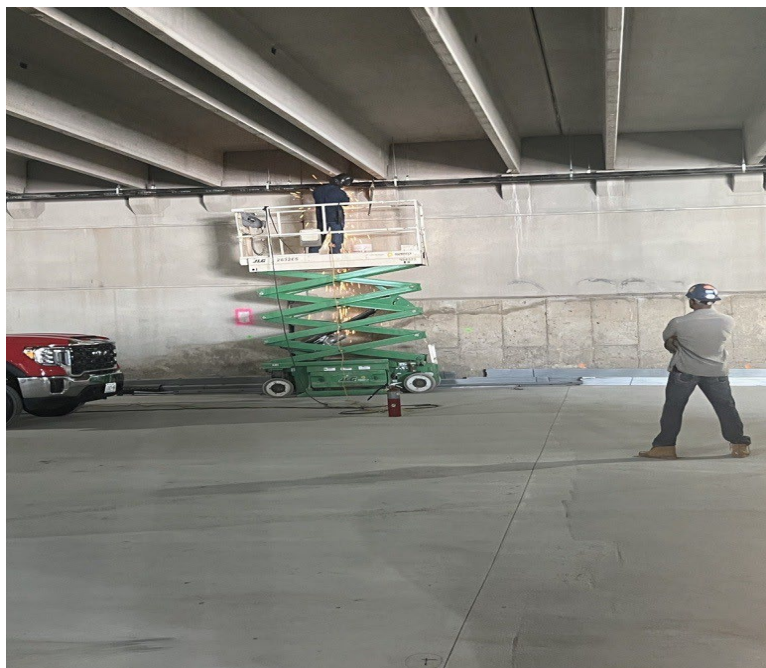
Welder installing overhead plumbing on first floor, looking southwest
